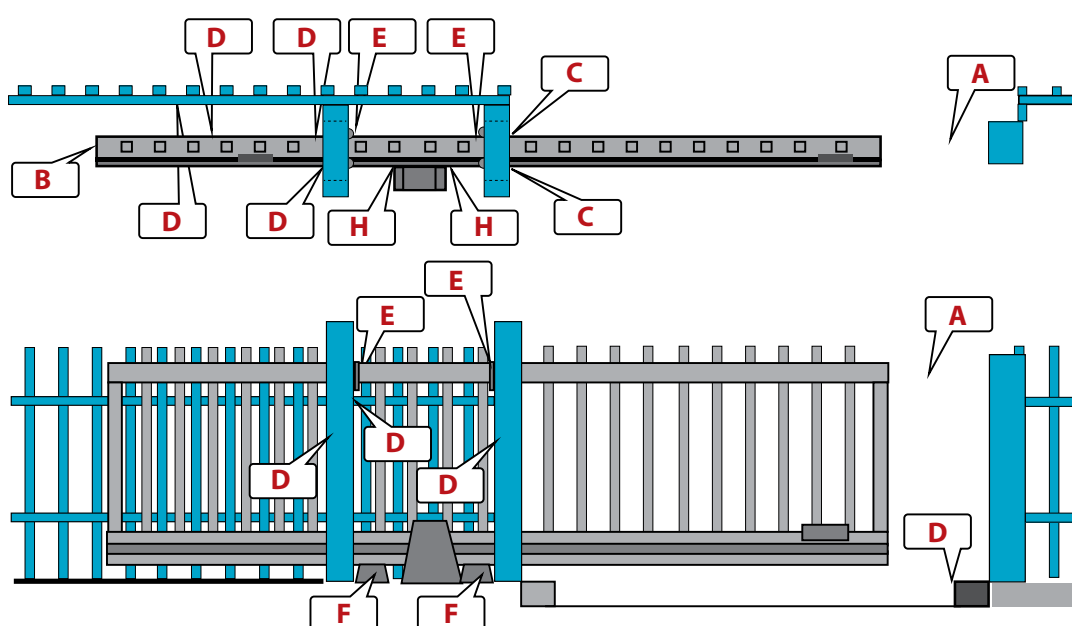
Plan and elevation view of a powered cantilever sliding gate
